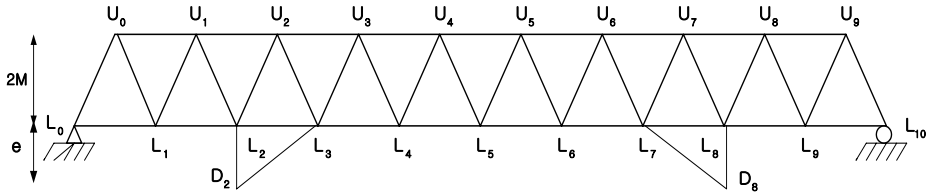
Statically Determinate Symmetrical Truss Posttensioned by External Two-drape Tendon
